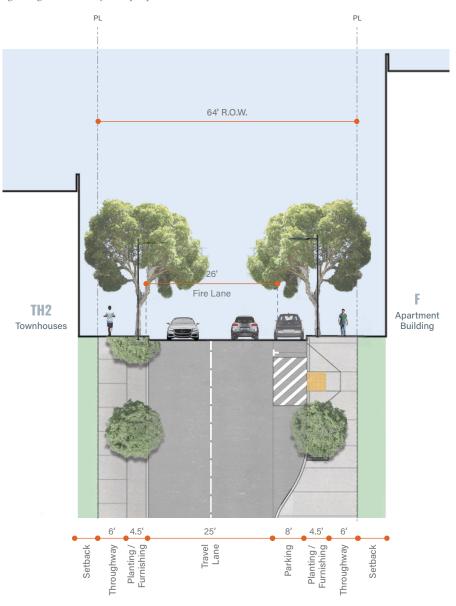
West Street, Section 1 \*see "Figure 5.15-2: West Street, Site Plan W.2 & W.3".
